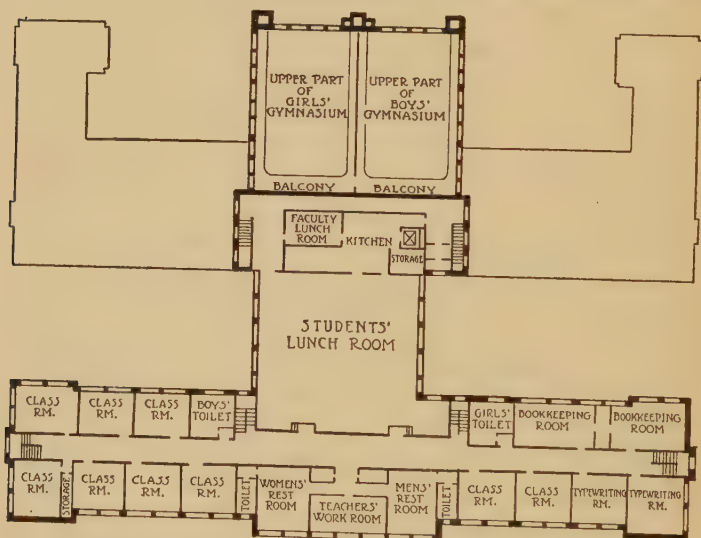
Third-floor plan, Carlos M. Cole Junior High School, Denver
